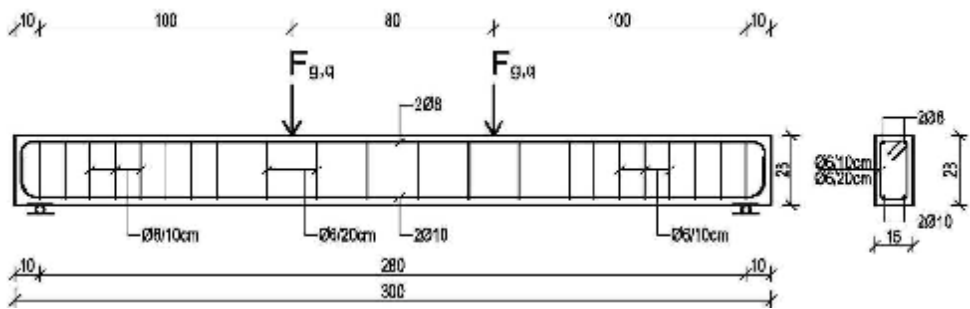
Geometry, reinforcement and loading scheme of the full scale beams
